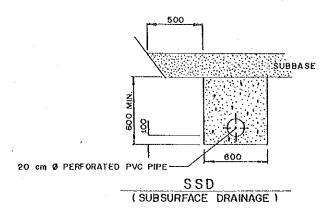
TYPICAL CROSS-SECTION OF SUBSURFACE DRAINAGE
